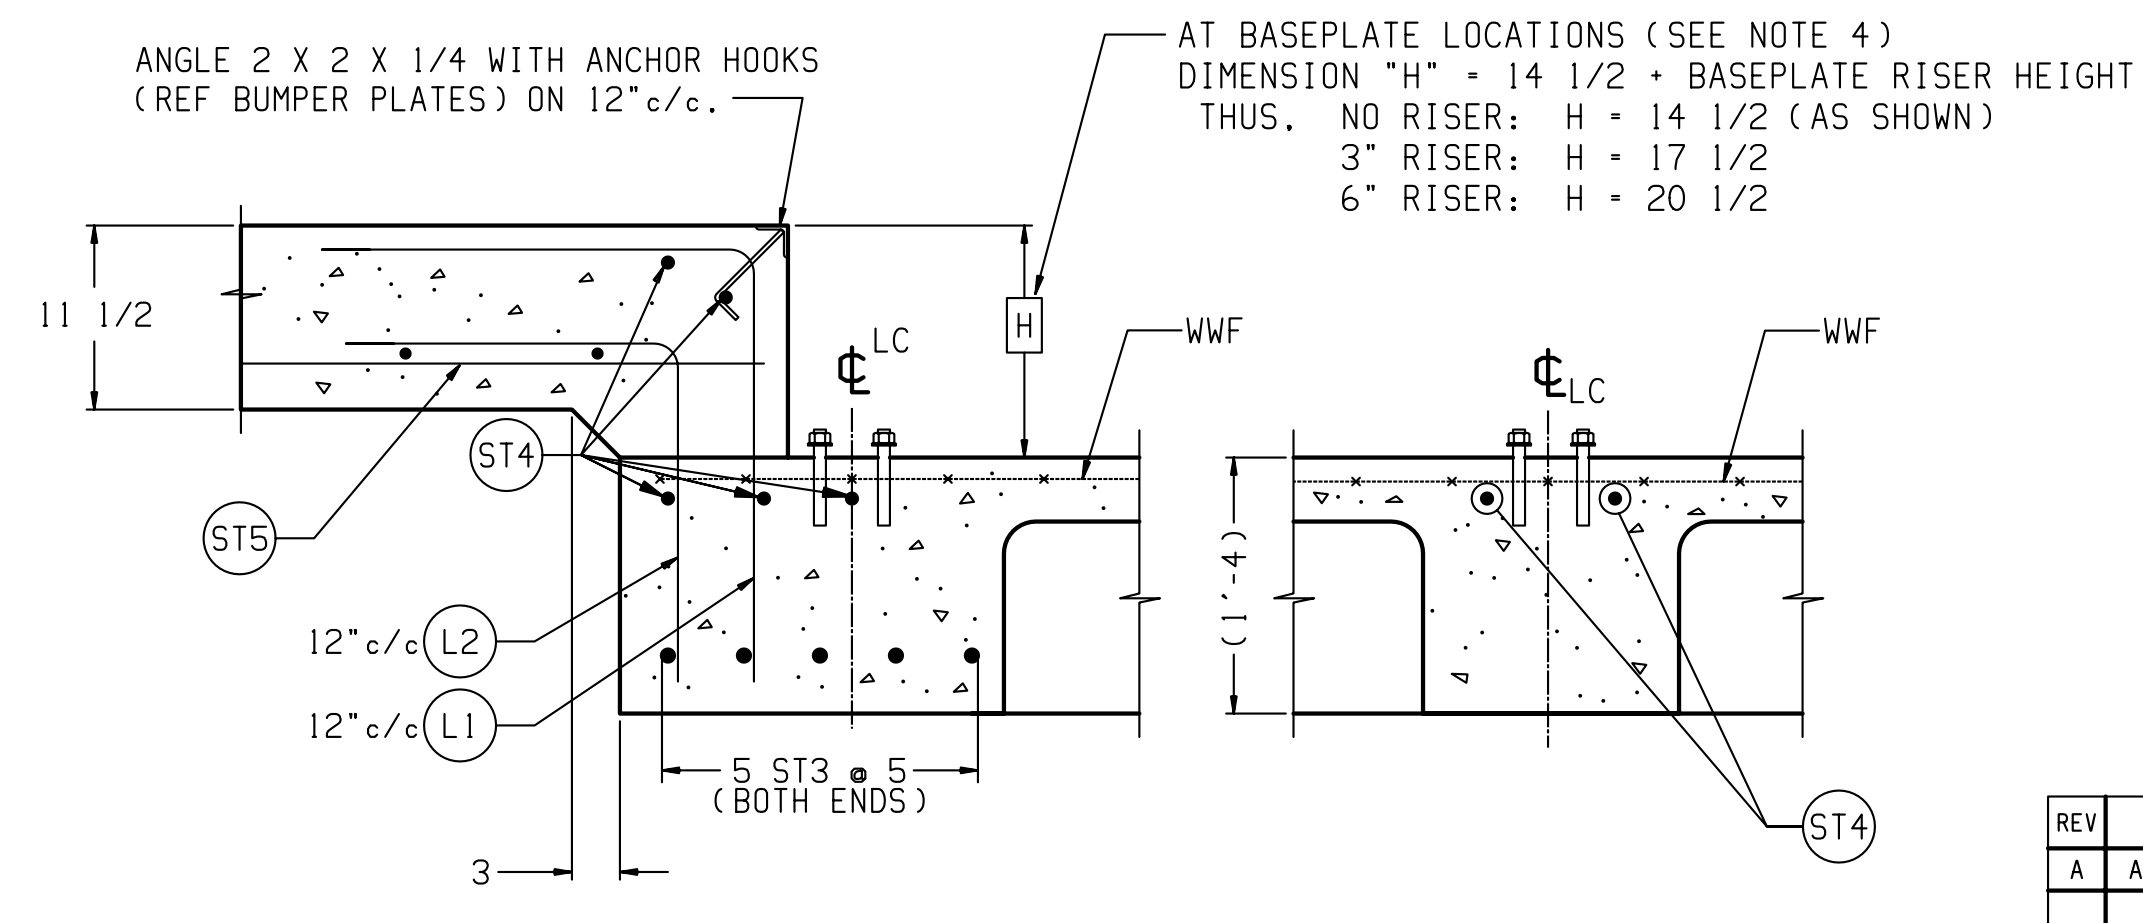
DETAIL "L" ANCHOR LOCATIONS (OTHER SIDE IS OPPOSITE)
